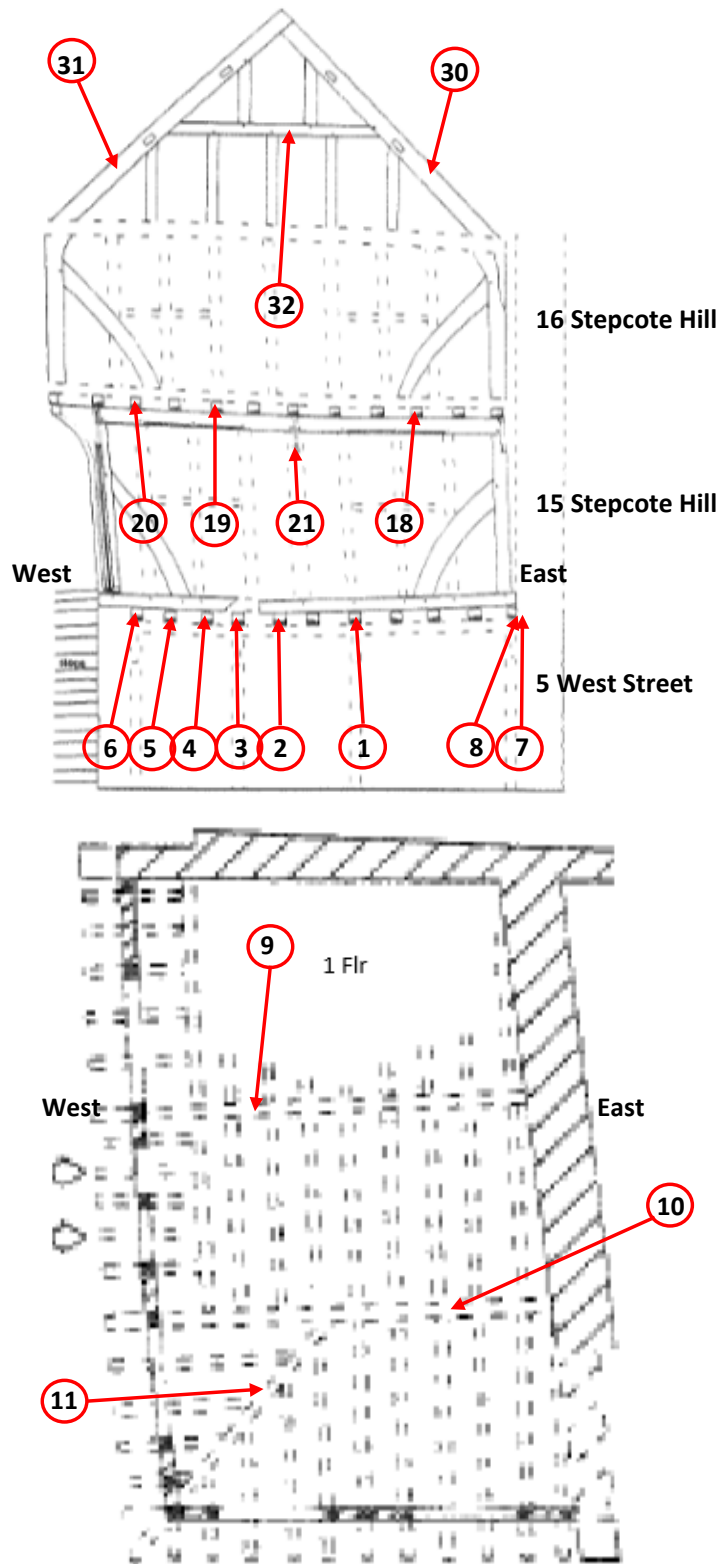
/b: Section through truss 3/West Street frontage of the western building (top) and ceiling plan of 15 Stepcote Hill (bottom) to show sampled timbers (after Dunkley and Templeton in Dunkley et al 1985)
